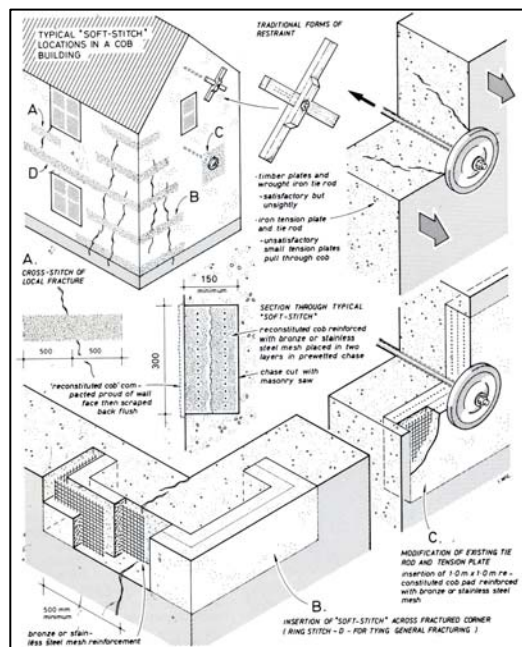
Illustration showing the stitching, bonding, and grouting process used to repair cob walls. (Image: John and Nicola Ashurst)
